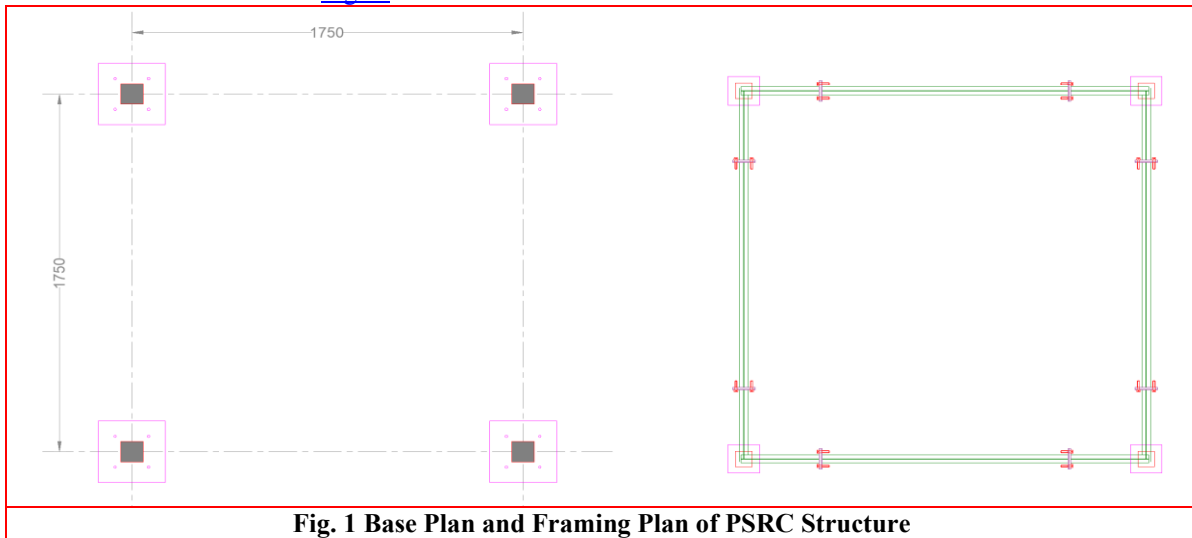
Base Plan and Framing Plan of PSRC Structure
